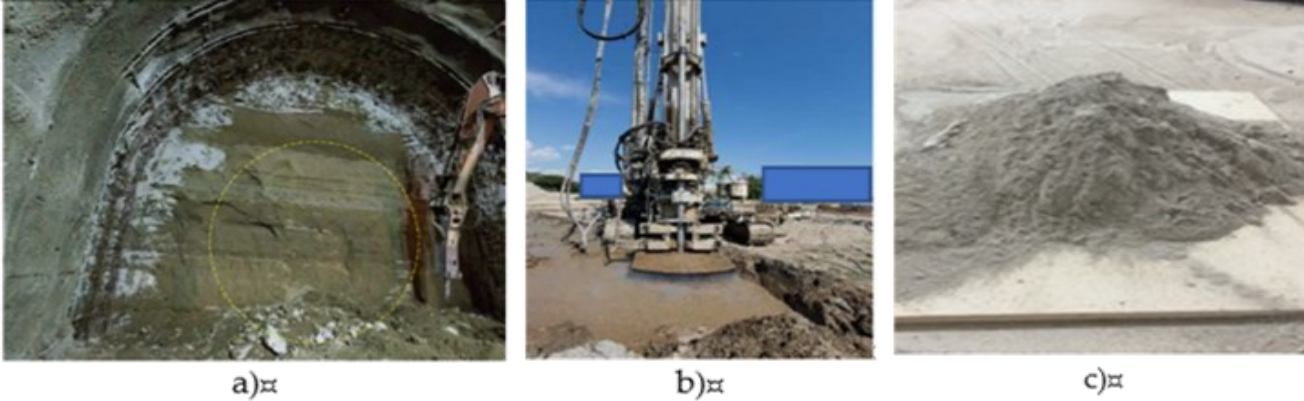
Jet grouting waste: a) jet grouting columns, b) JGW drawn to the surface; c) JGW after grinding action
